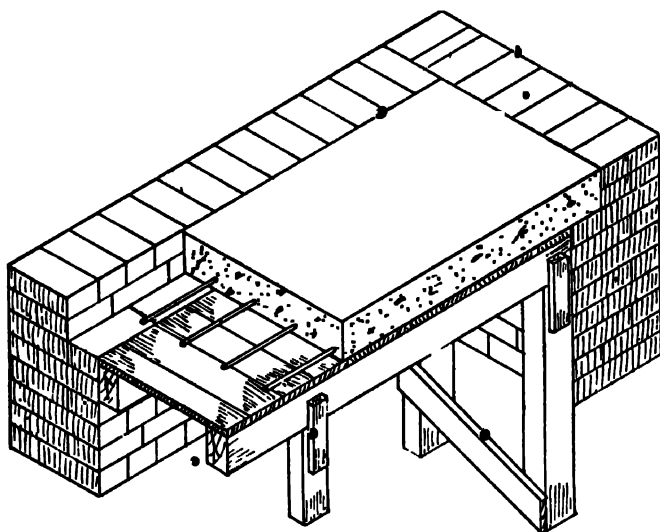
SUSPENDED CONCRETE FLOOR SLAB
